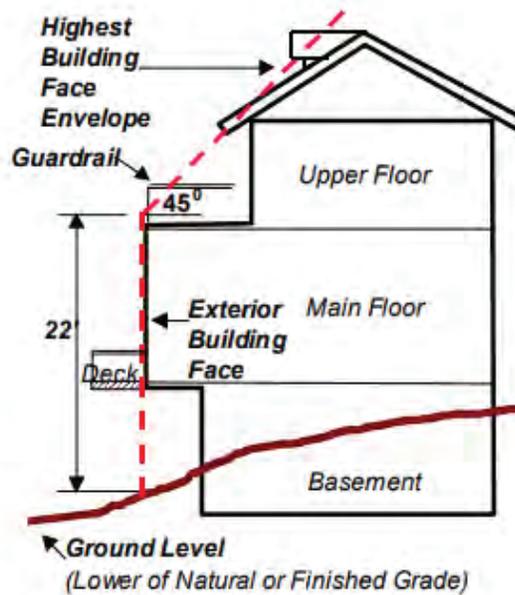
Diagram from Zoning Bylaw how to measure highest building face envelope
